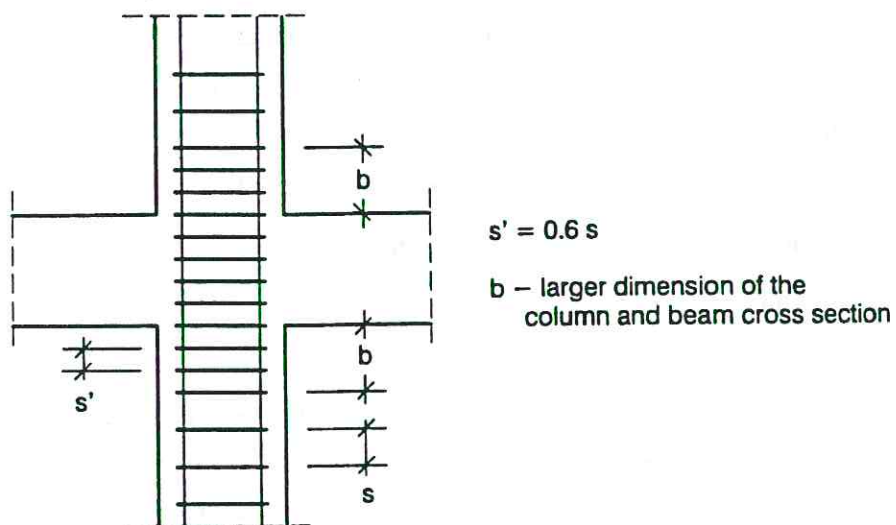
Illustration of transverse reinforcement detailing for a beam-column connection
